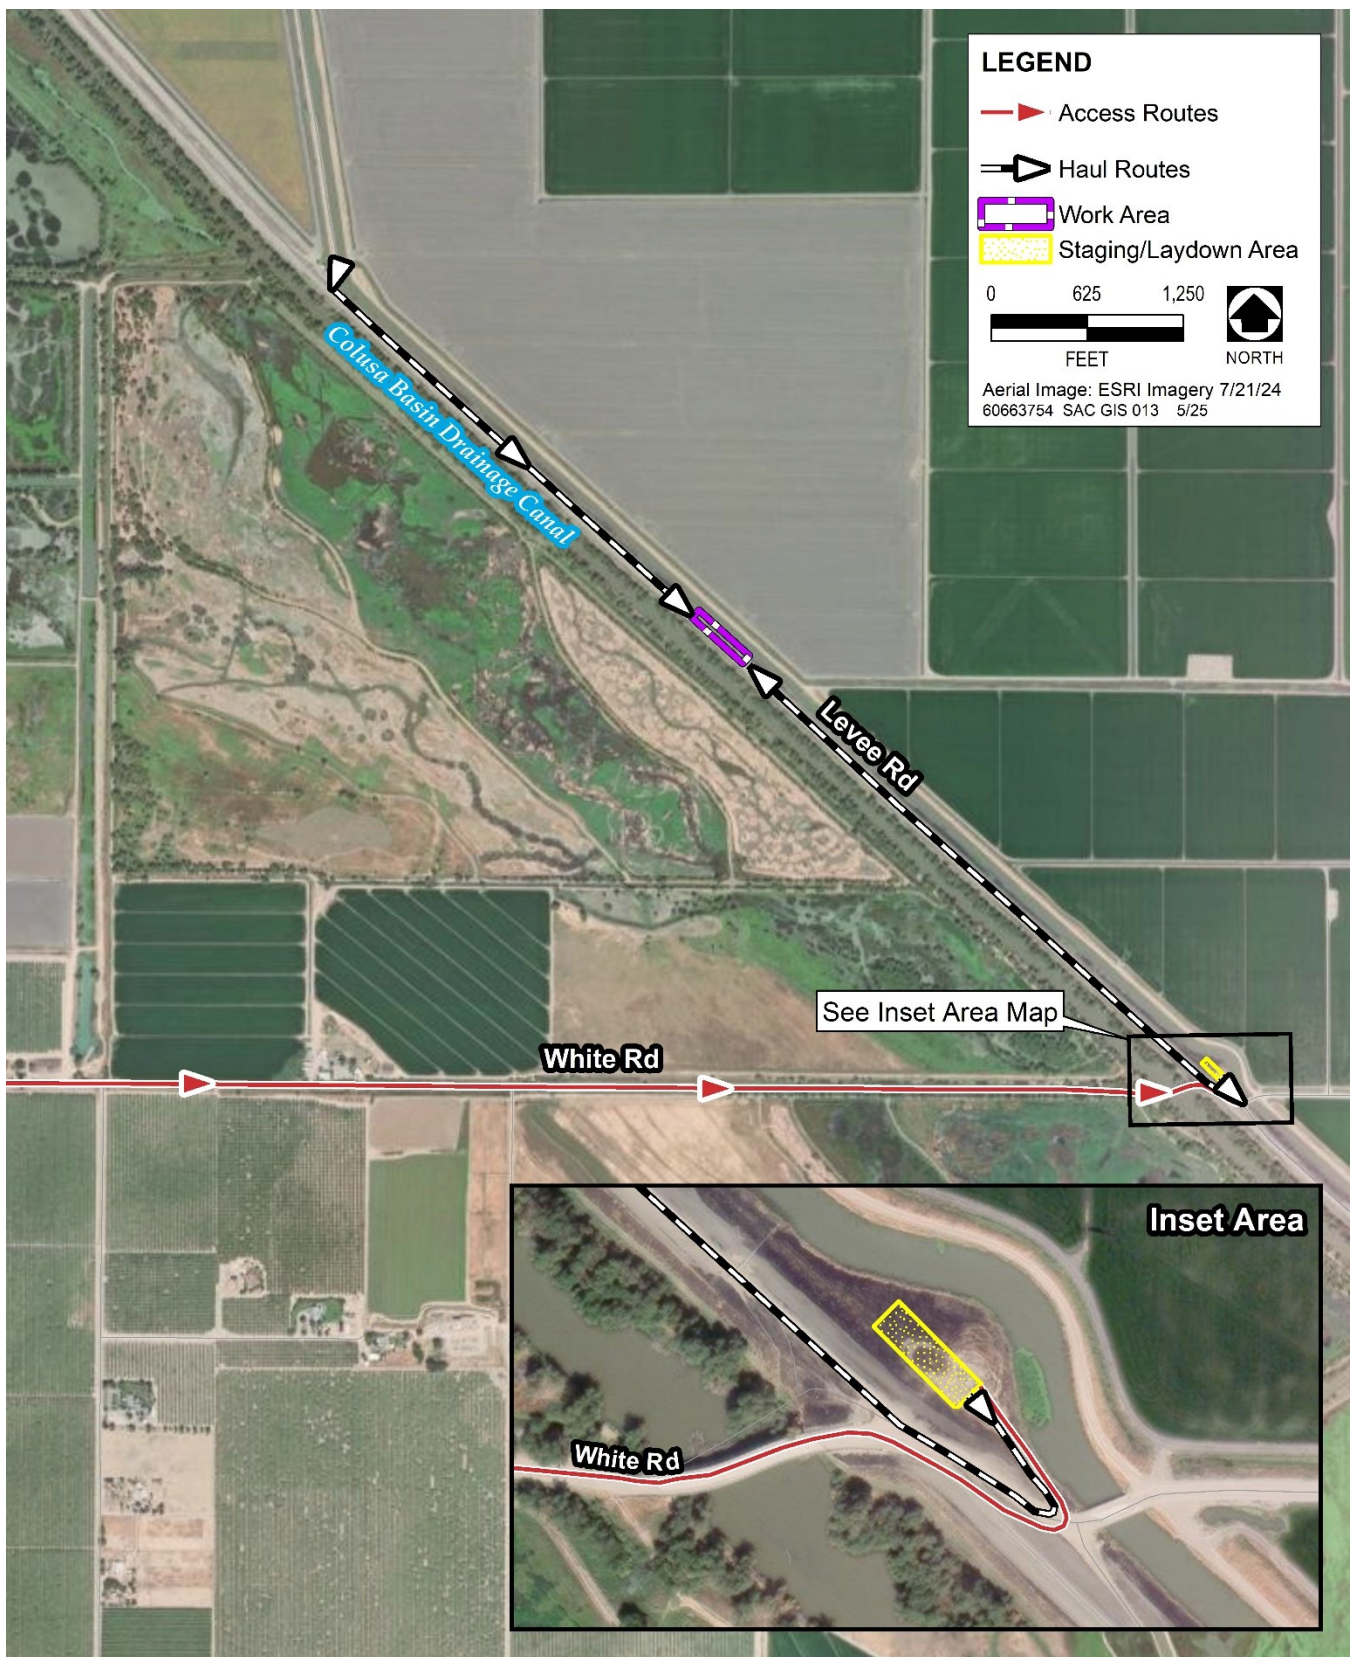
Site 23-078 Proposed Work Area, Haul Route, and Staging/Laydown Area
